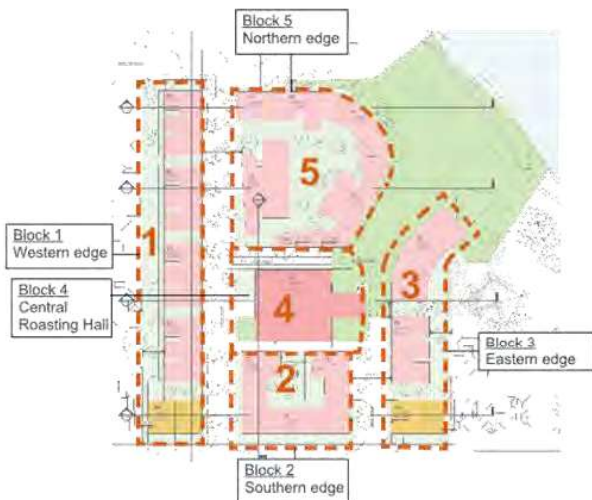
Key buildings identified over the Roof Plan, amended PP (May 2022) (Source: BVN 2019)
